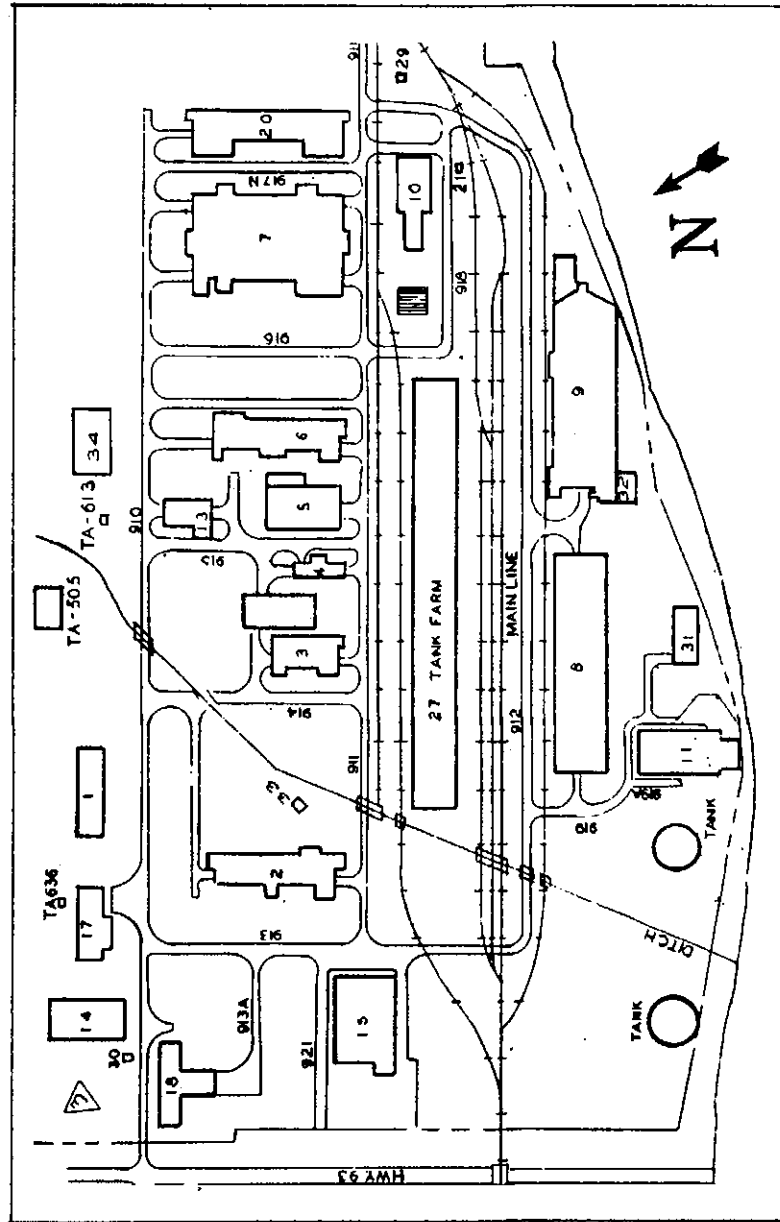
Building location plan of Plant A. (Source: Drawing No. 7651-212/1226.03, unpublished, prepared by Holston Defense Corporation, 1970, revised 1976, HSAAP Archives.)
